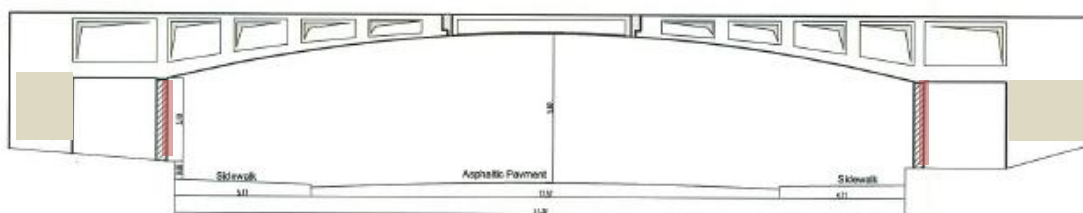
Disposition of exterior (brown) and interior walls of bridge (gray) (section 6-6)
